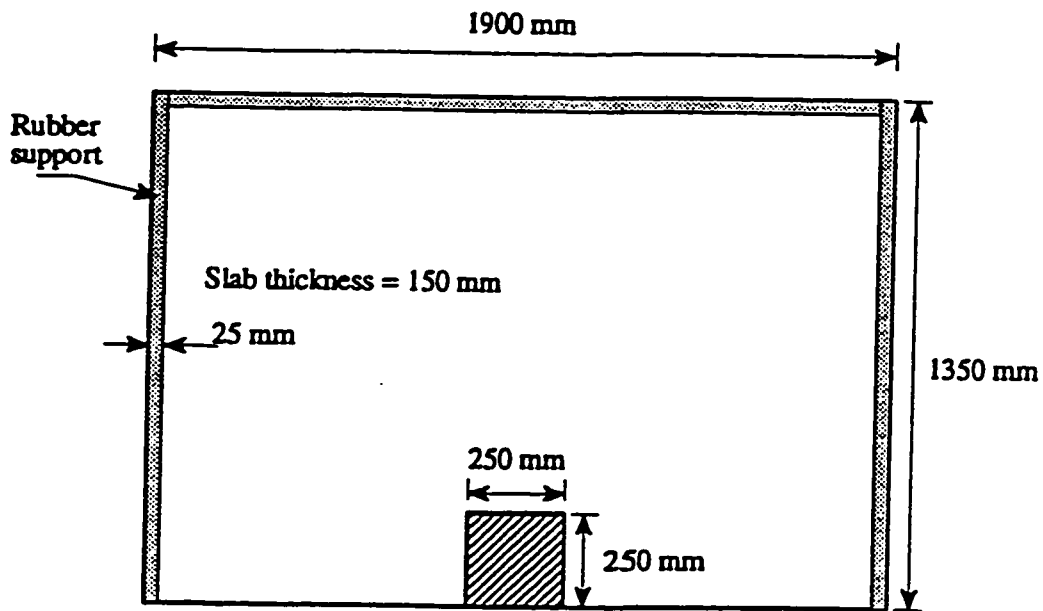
Plan of slab-column connections SC-3 and SC-4 in Sherif's work
